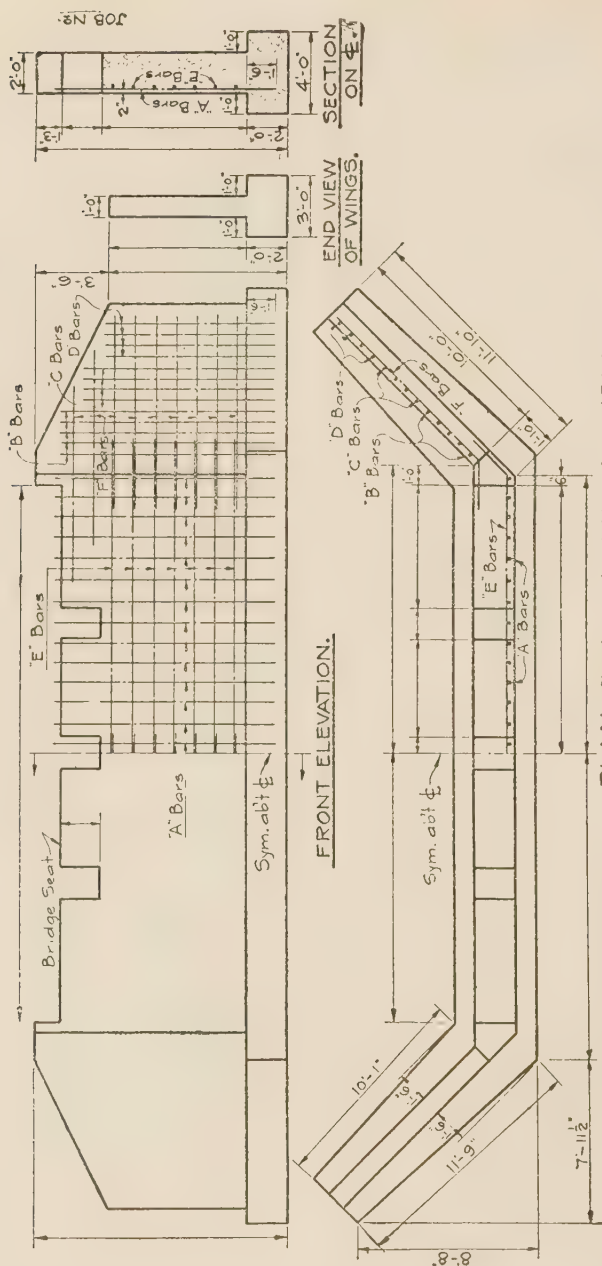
Deck reinforced concrete girder bridge, Wisconsin Highway Commission.
